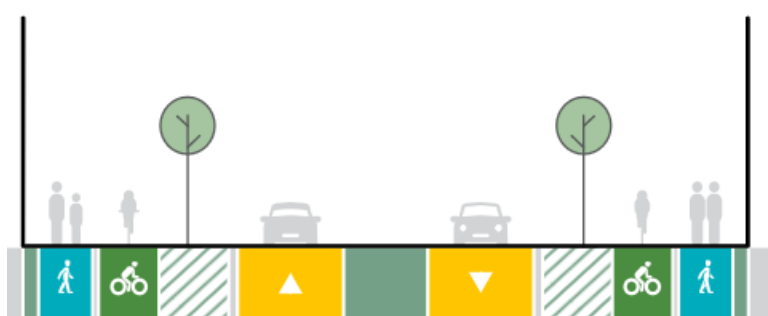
CFAF Outcome S3: Luckens Road to Brigham Creek Road Indicative 24m cross section
